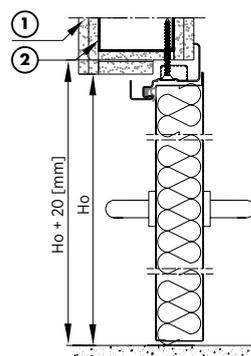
Installation of the double-leaf door with the corner frame in a masonry wall, vertical cross-section
